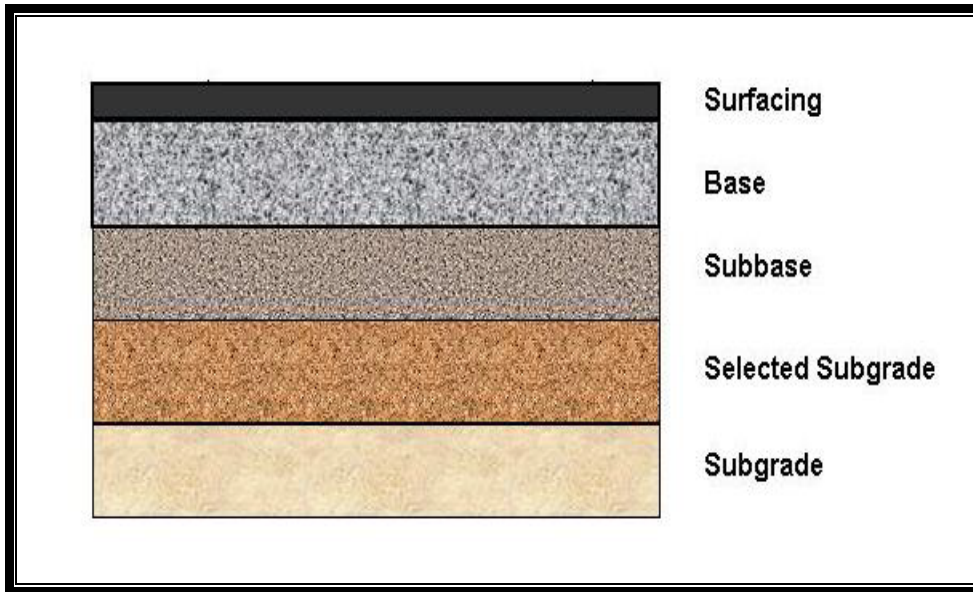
1. Road cross-section showing road layers (SANRAL,2014)
